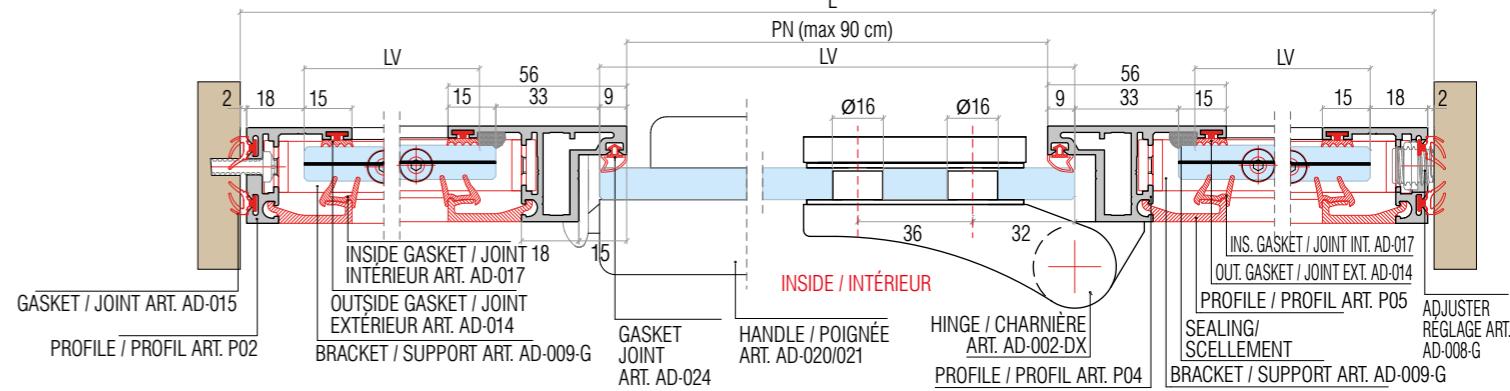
DETAIL / DÉTAIL C (VIEW FROM THE OUTSIDE VUE DU CÔTÉ EXTÉRIEUR)
